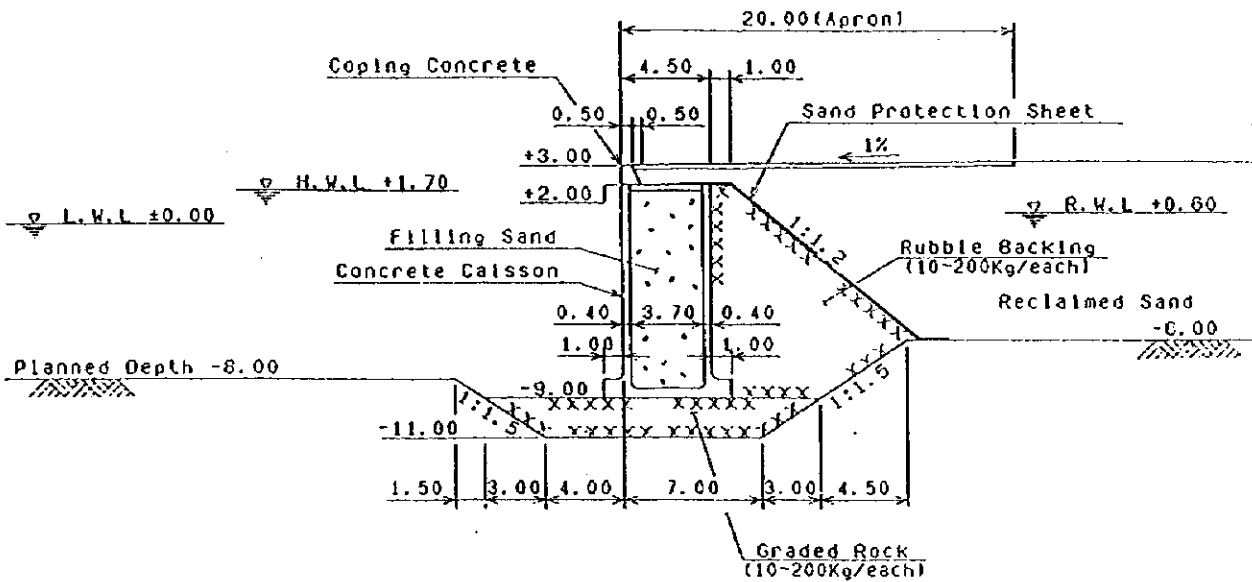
Typical Cross Section of Quaywall E1, E2 in Dung Quat (RC Caisson)
